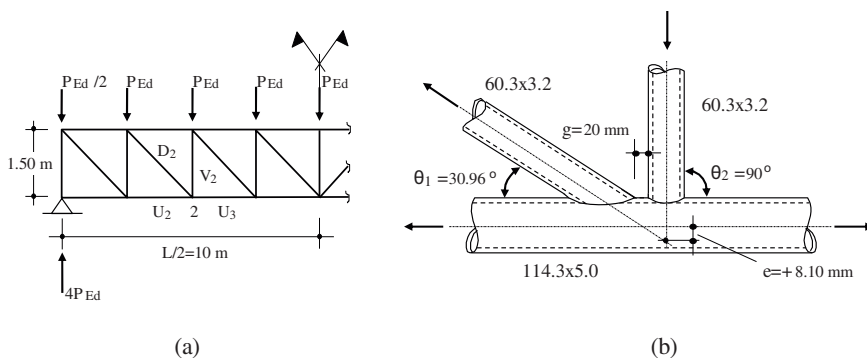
Geometrical properties of the truss (a) and detail of joint 2 (b)
